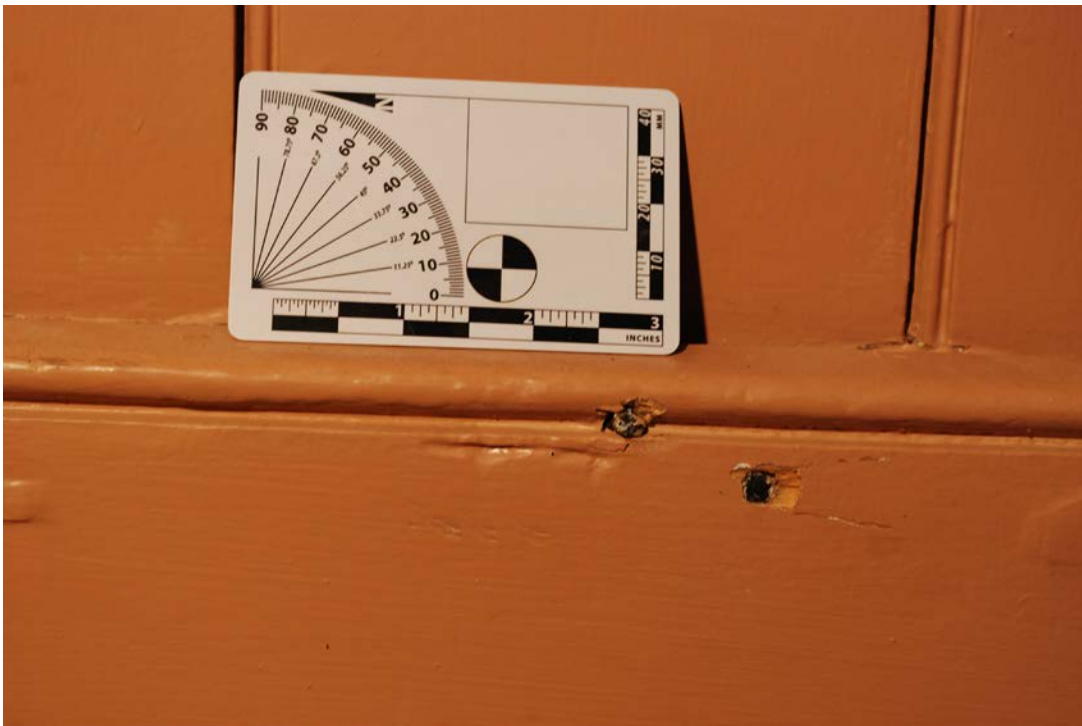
The Architectural Conservation Laboratory, “Detail of baseboard and fasteners adjacent to meeting room staircase” (July 12, 2012).
